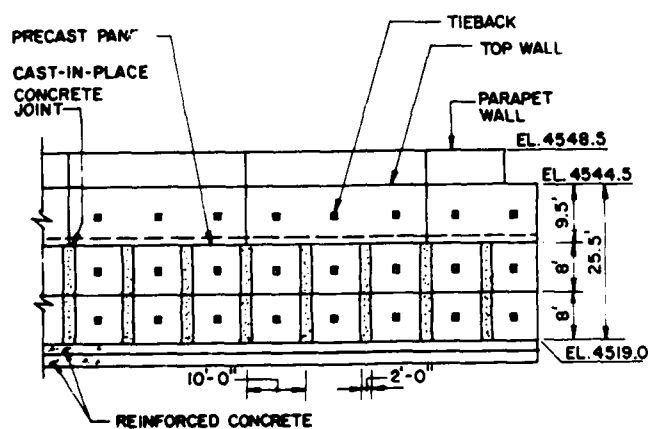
TYPICAL ELEMENT WALL SECTION, ROGERS PASS
